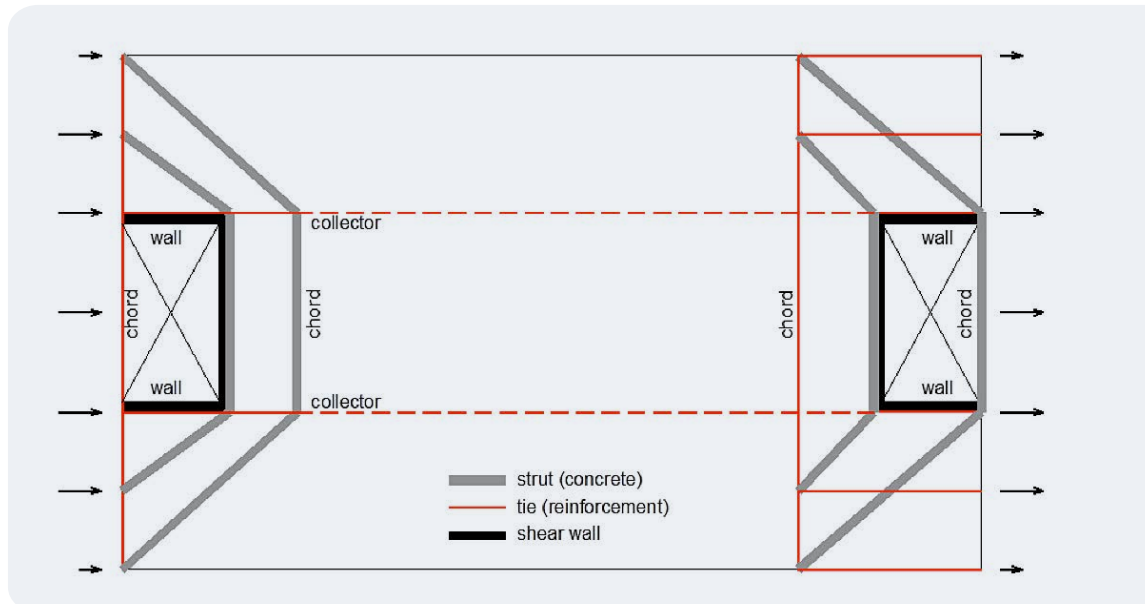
Strut and tie model for wind load perpendicular to the short side of the building.
